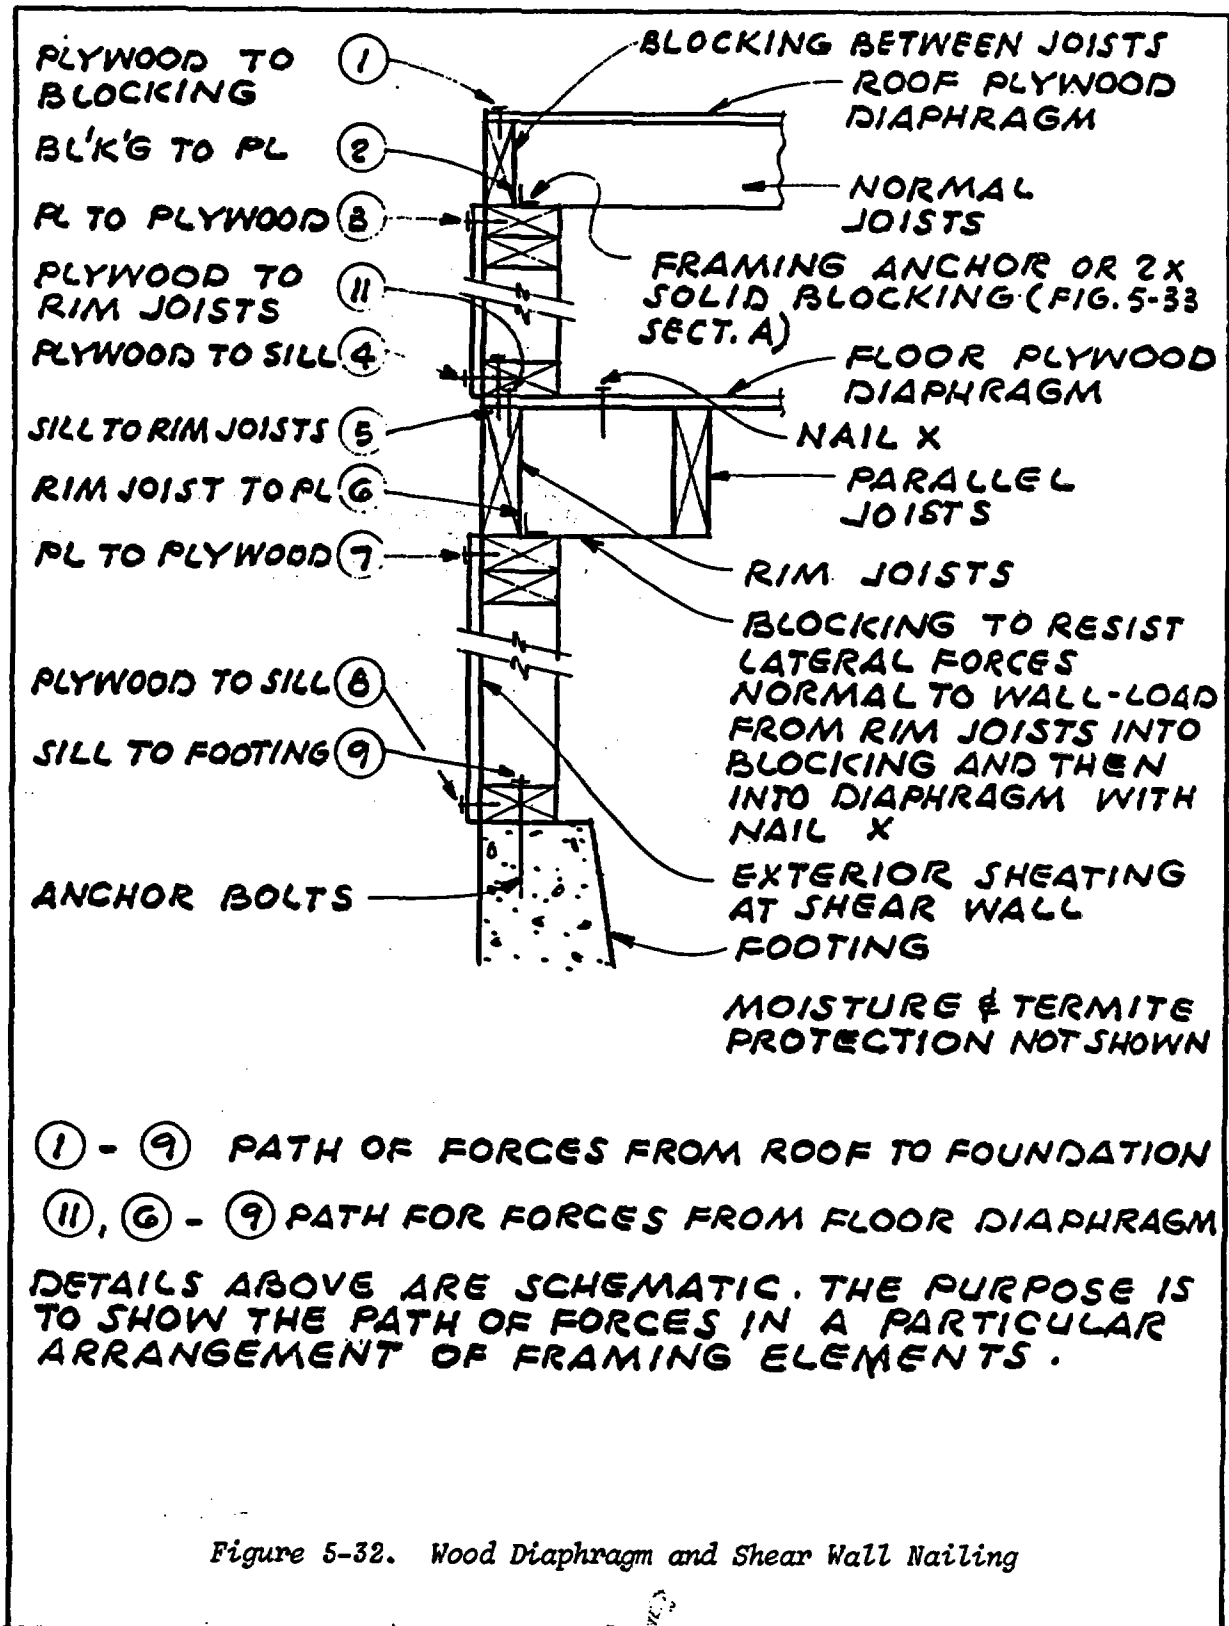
Wood Diaphragm and Shear Wall Nailing
